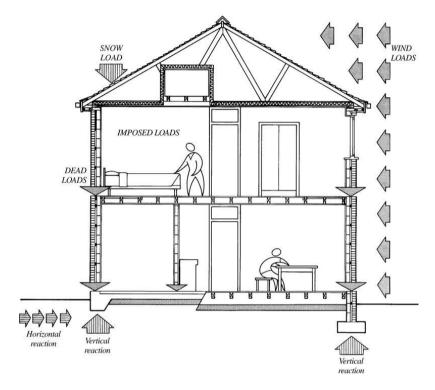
Combined building loads. (See also Figs 5.1, 5.2 and 5.3)
